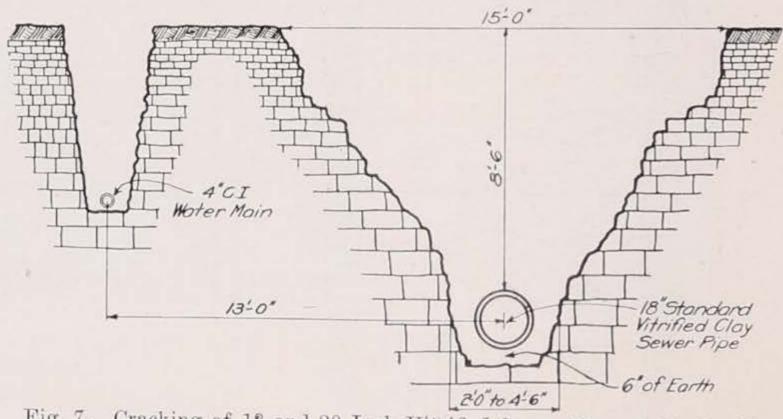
Cracking of 18 and 20 Inch Vitrified Sewer Pipe at Charles City, Iowa.
